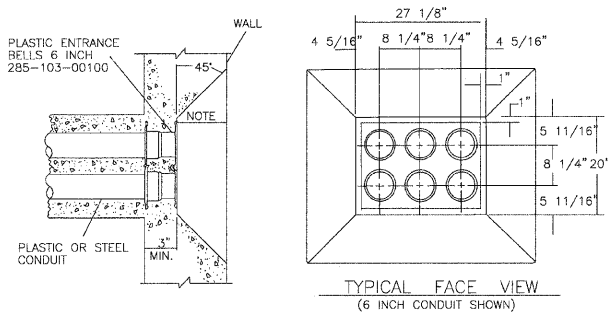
MANHOLE ENTRANCE WITH PLASTIC TERMINATORS (OLDER STYLE) FOR PLASTIC OR STEEL CONDUIT (POCKET TYPE)
